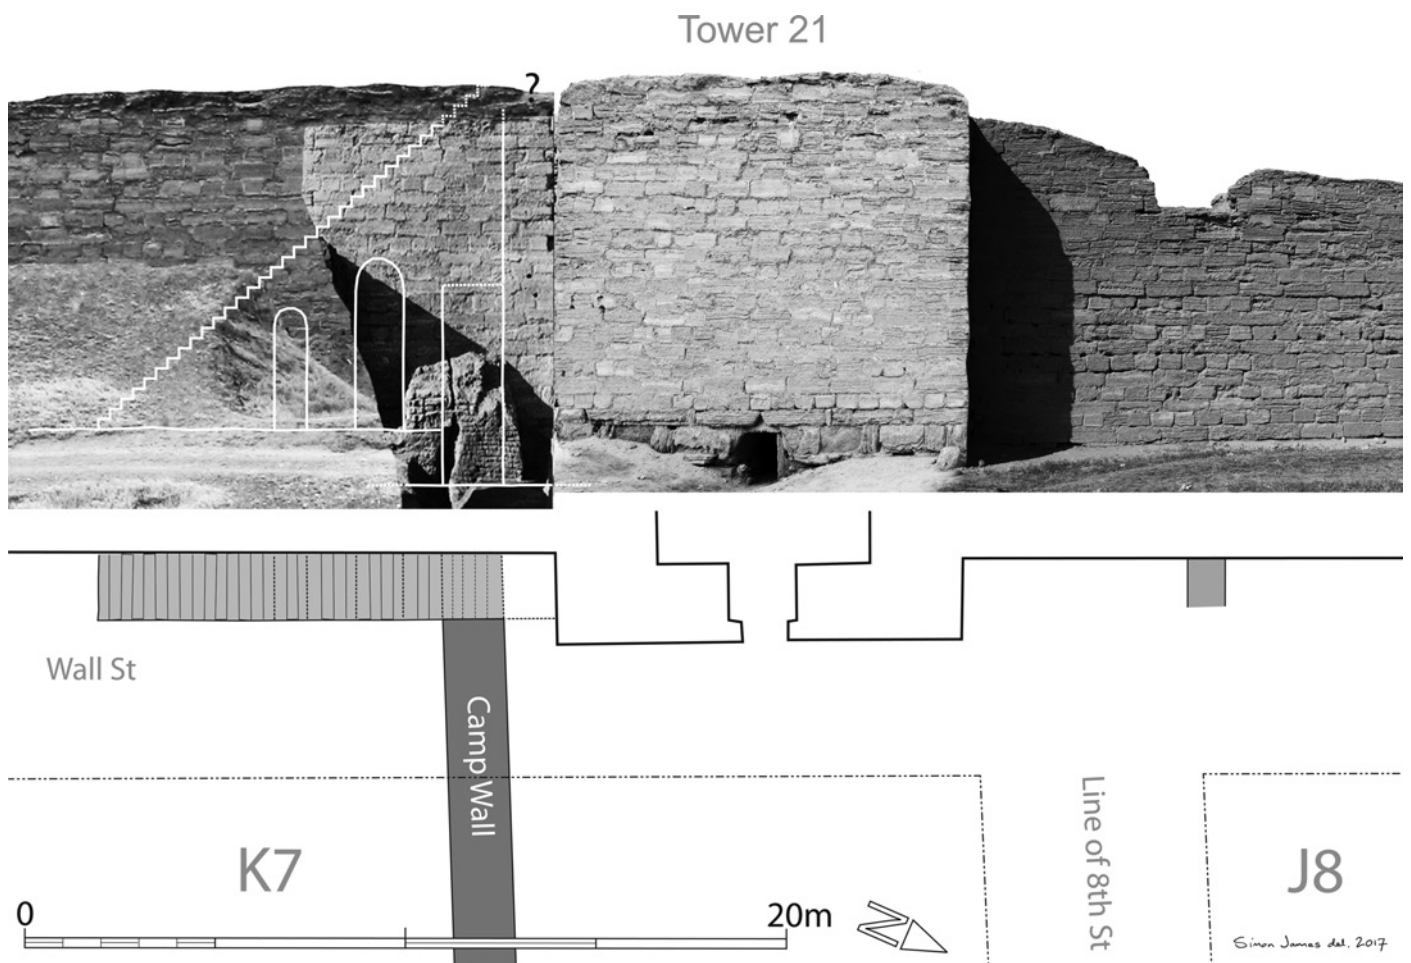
Plan and corrected photographic elevation of the area around Tower 21, and the origin point of the camp wall. Based on Detweiler's archive sketch plan and measurements, observations in 2005–10, and archive photographs.
